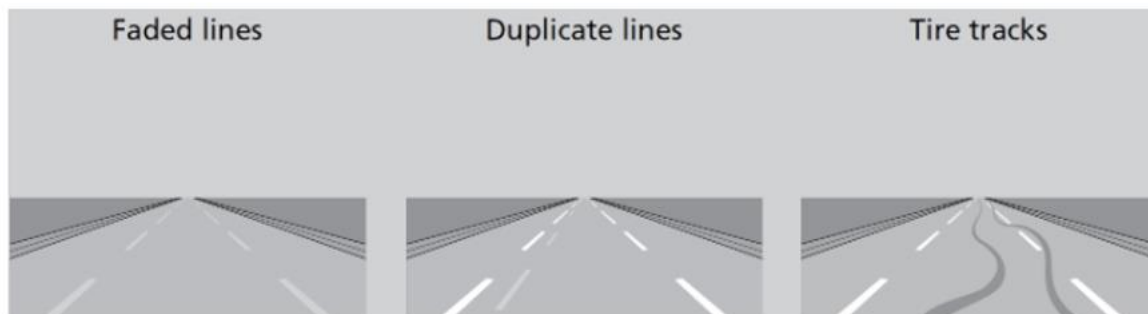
Confusing Pavement Marking on the Road (Honda, 2022).
